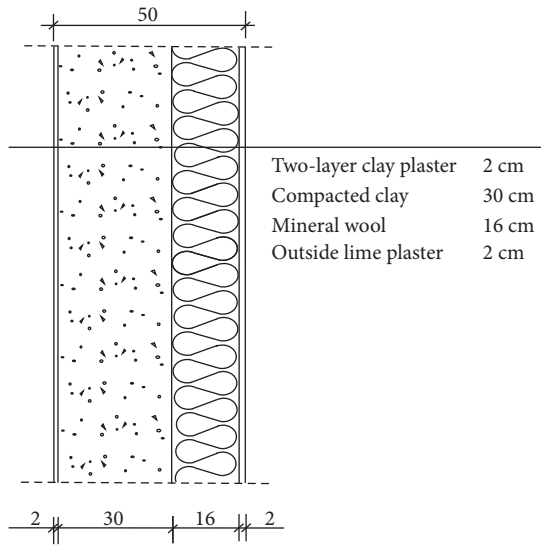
Cross section of the wall made of clay compacted in formwork.
